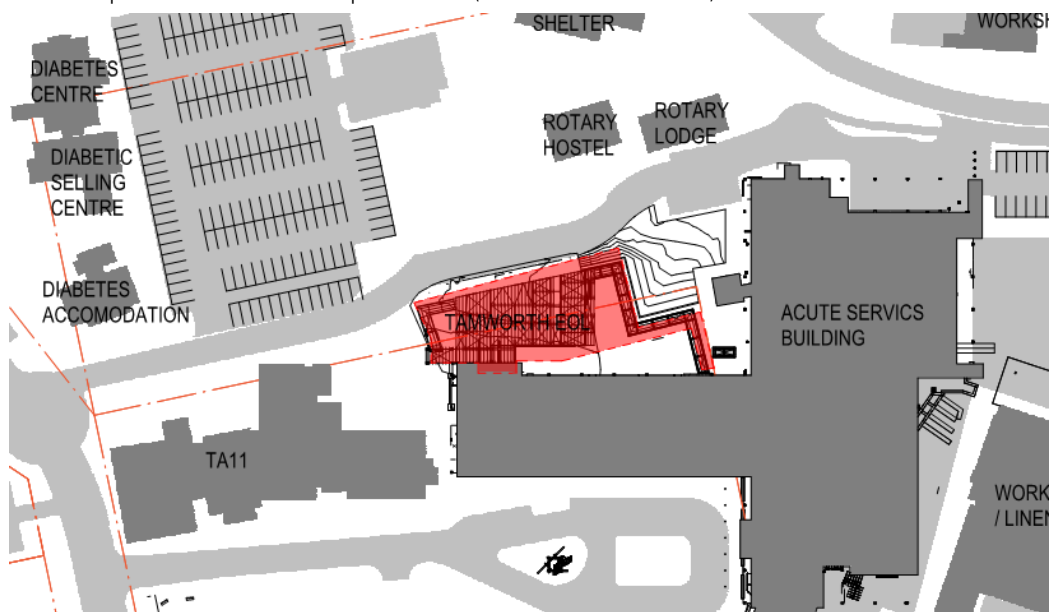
Palliative Care extension located more than 6 m from existing buildings on site
